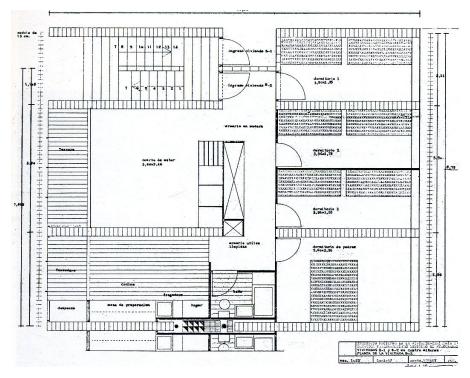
Fuencarral apartment floor plan (Fernández-Galiano et al., 1989)
